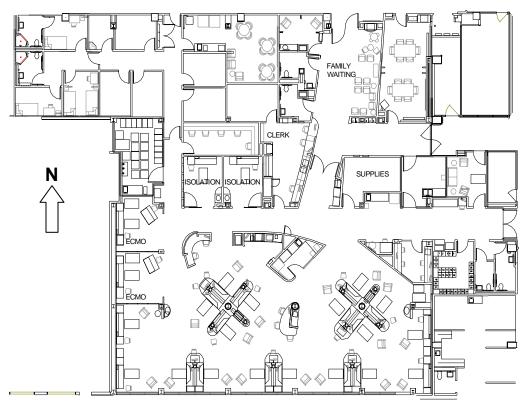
Open-bay neonatal intensive care unit #1 floor plan (not to scale).
